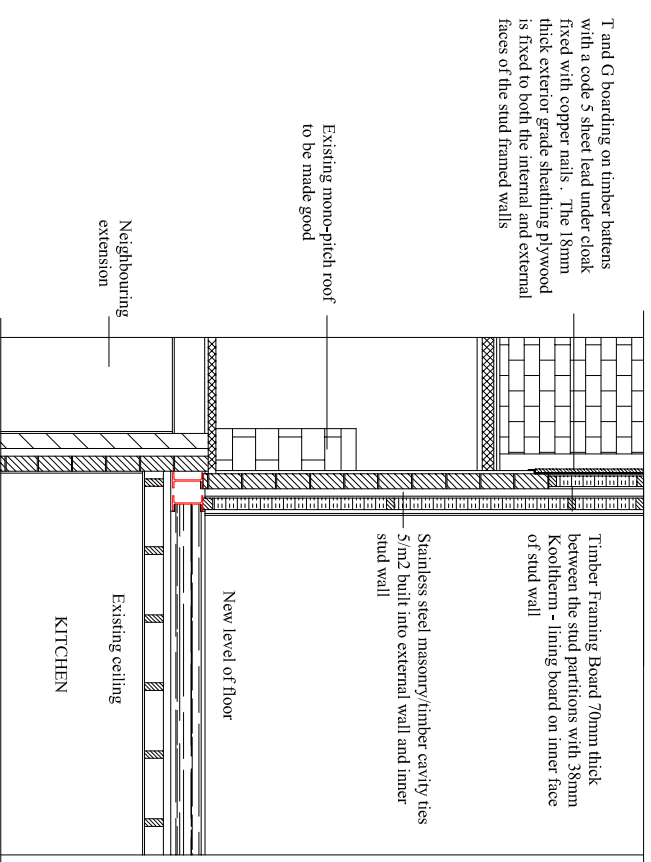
DETAIL "B" INDICATING POSITION OF UNIVERSAL BEAMS AND CLOSE BOARD WALL
